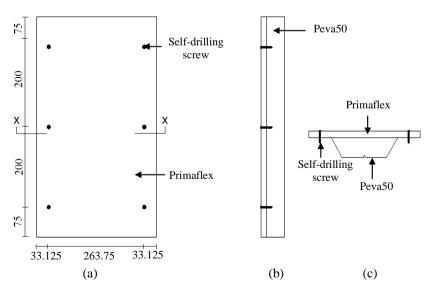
The schematic diagram for the push-out test using Peva50 (a) front view; (b) side view; (c) section X-X
